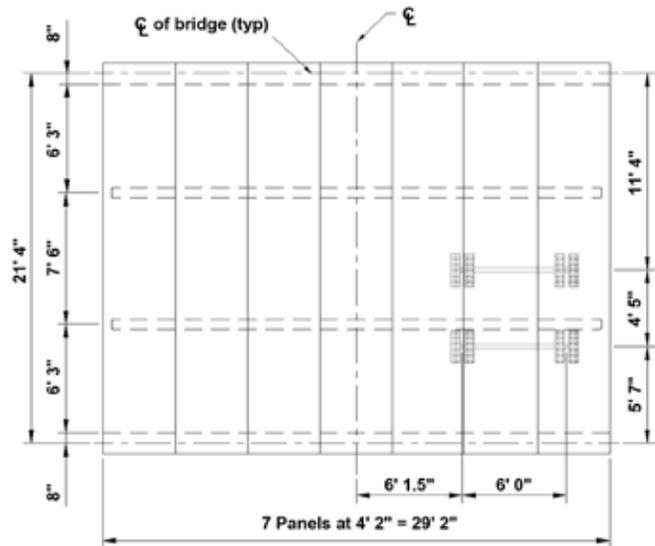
Controlling load position for Angelica Bridge, plan view. (The front axle is outside the bridge.)
